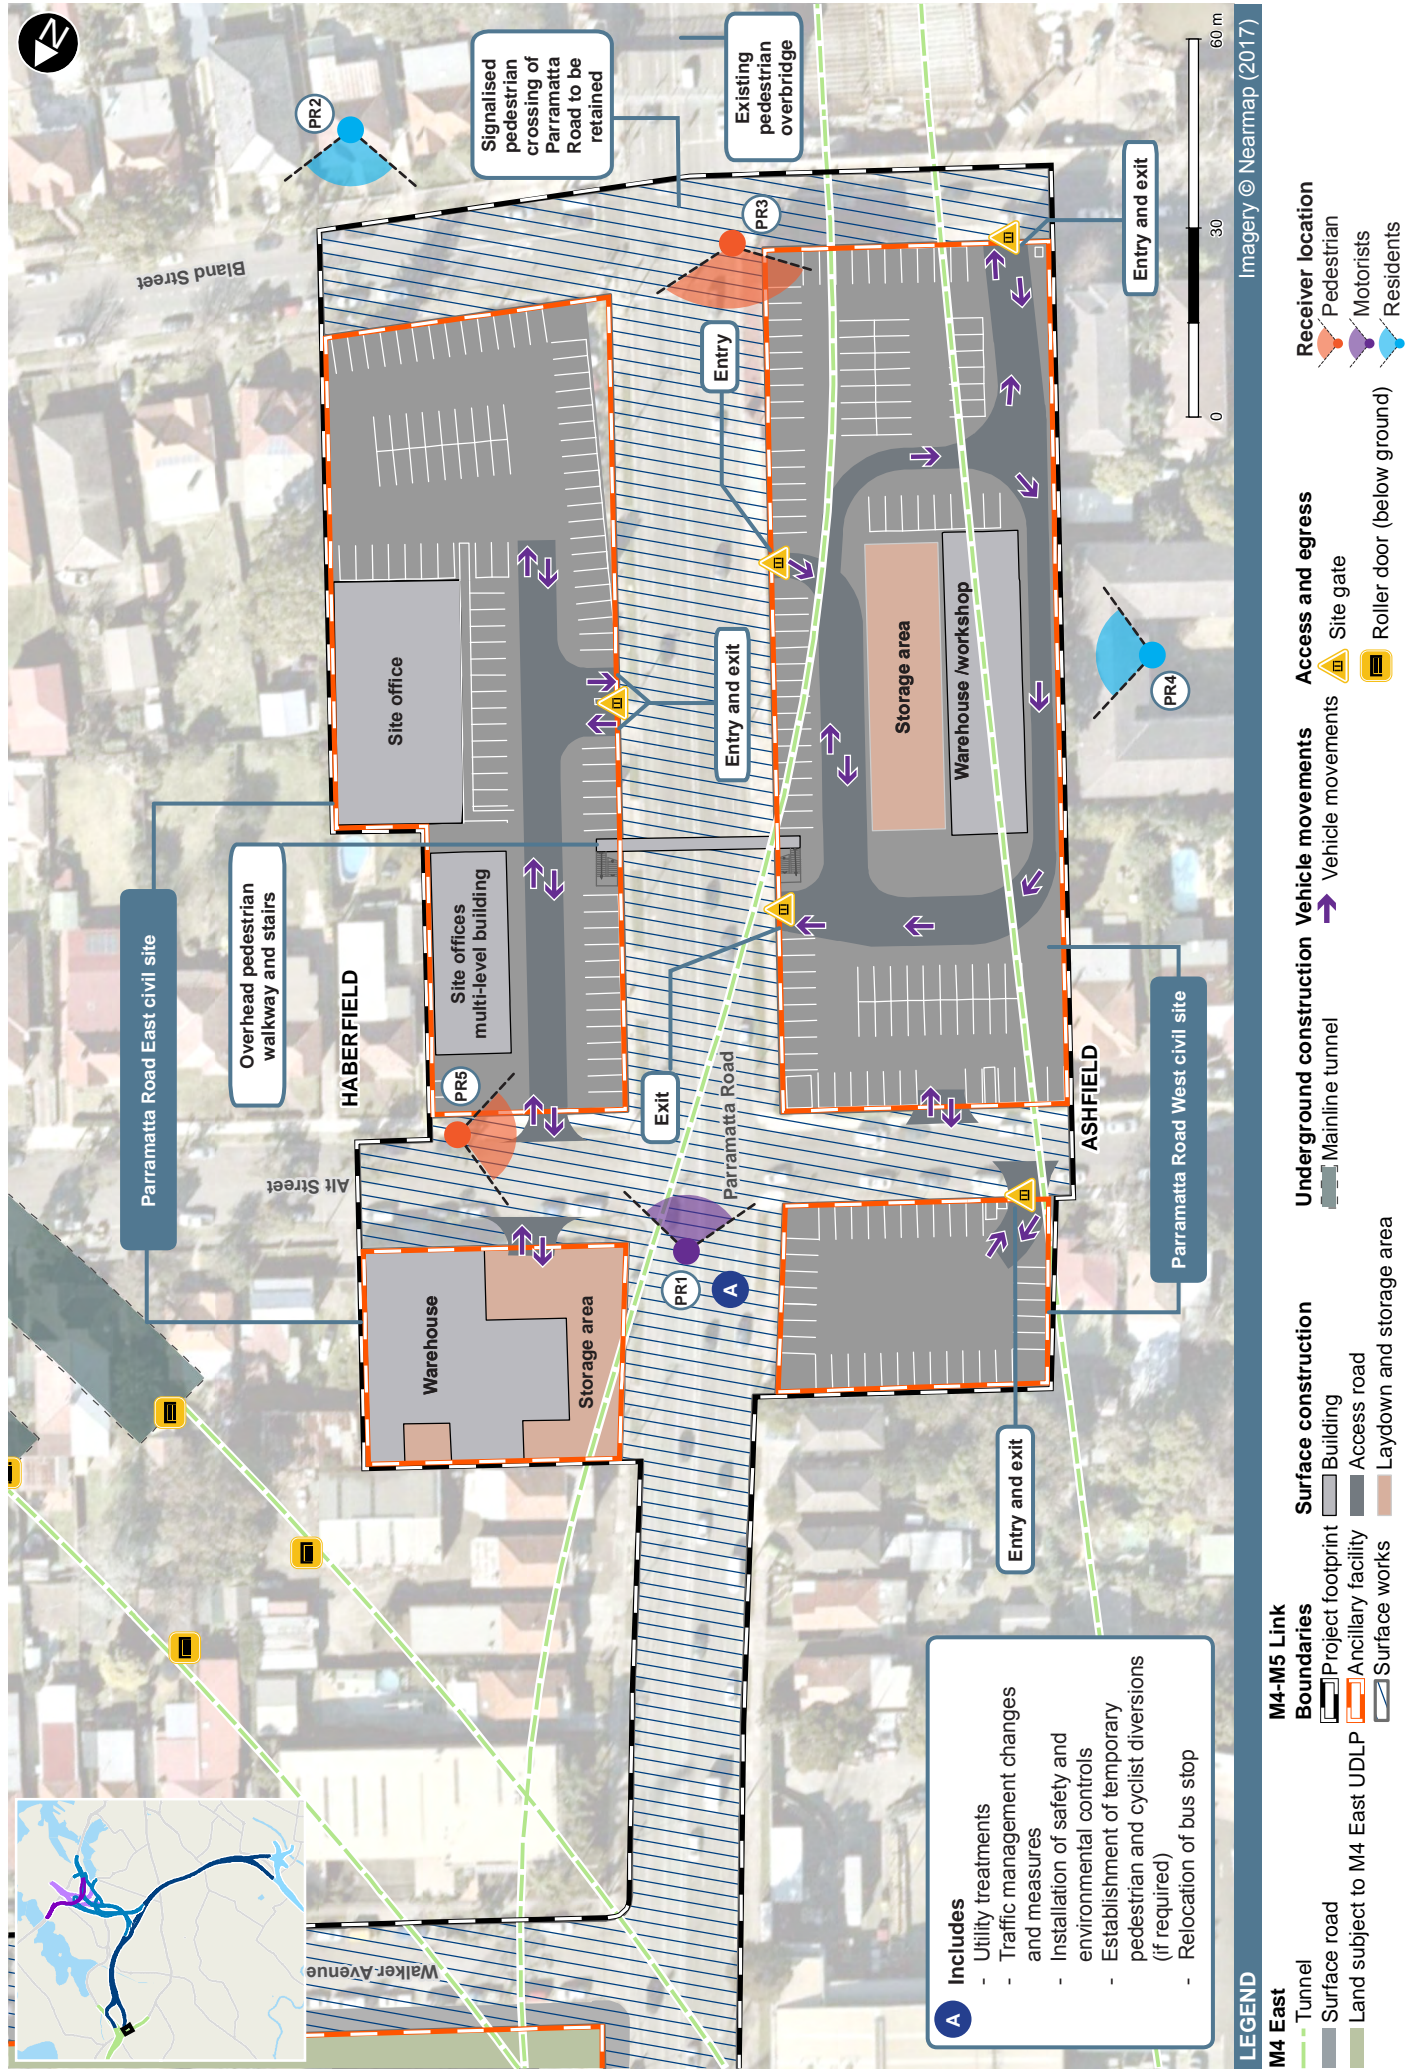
Parramatta Road West and Parramatta Road East civil sites representative receiver locations
